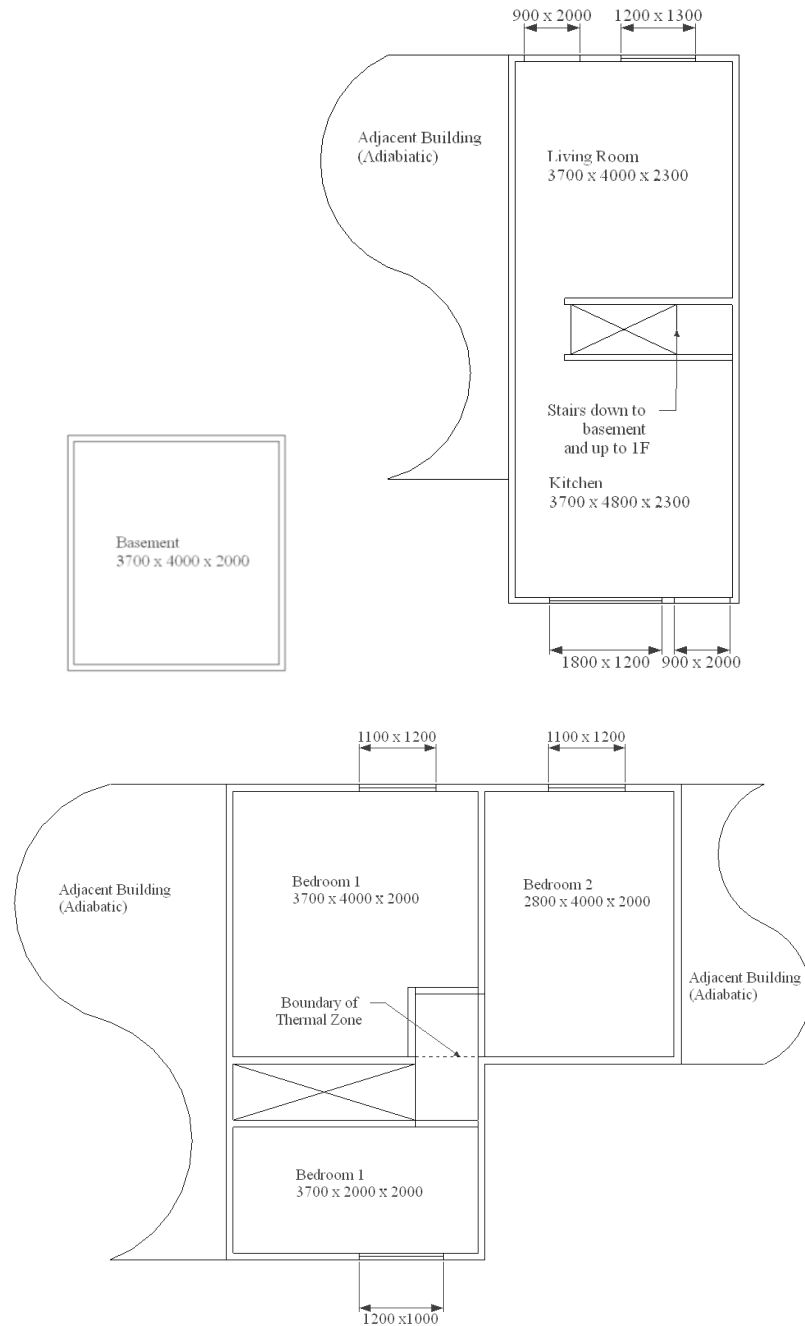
Basement and ground floor plan for the timed control building respectively.
